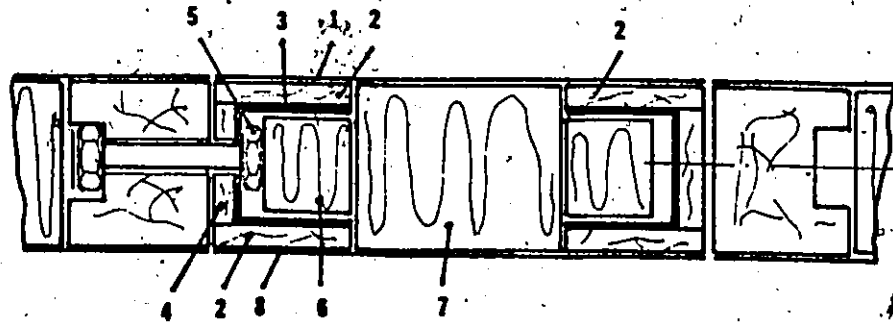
EXPLODED VIEW OF THE BASIC PANEL
